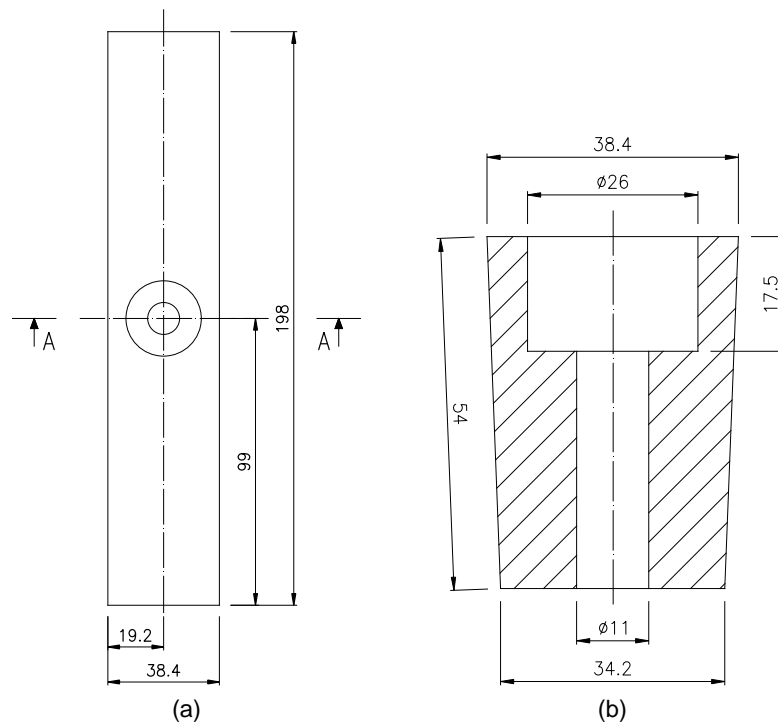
Voussoir: (a) top view; (b) cross-section on A-A
